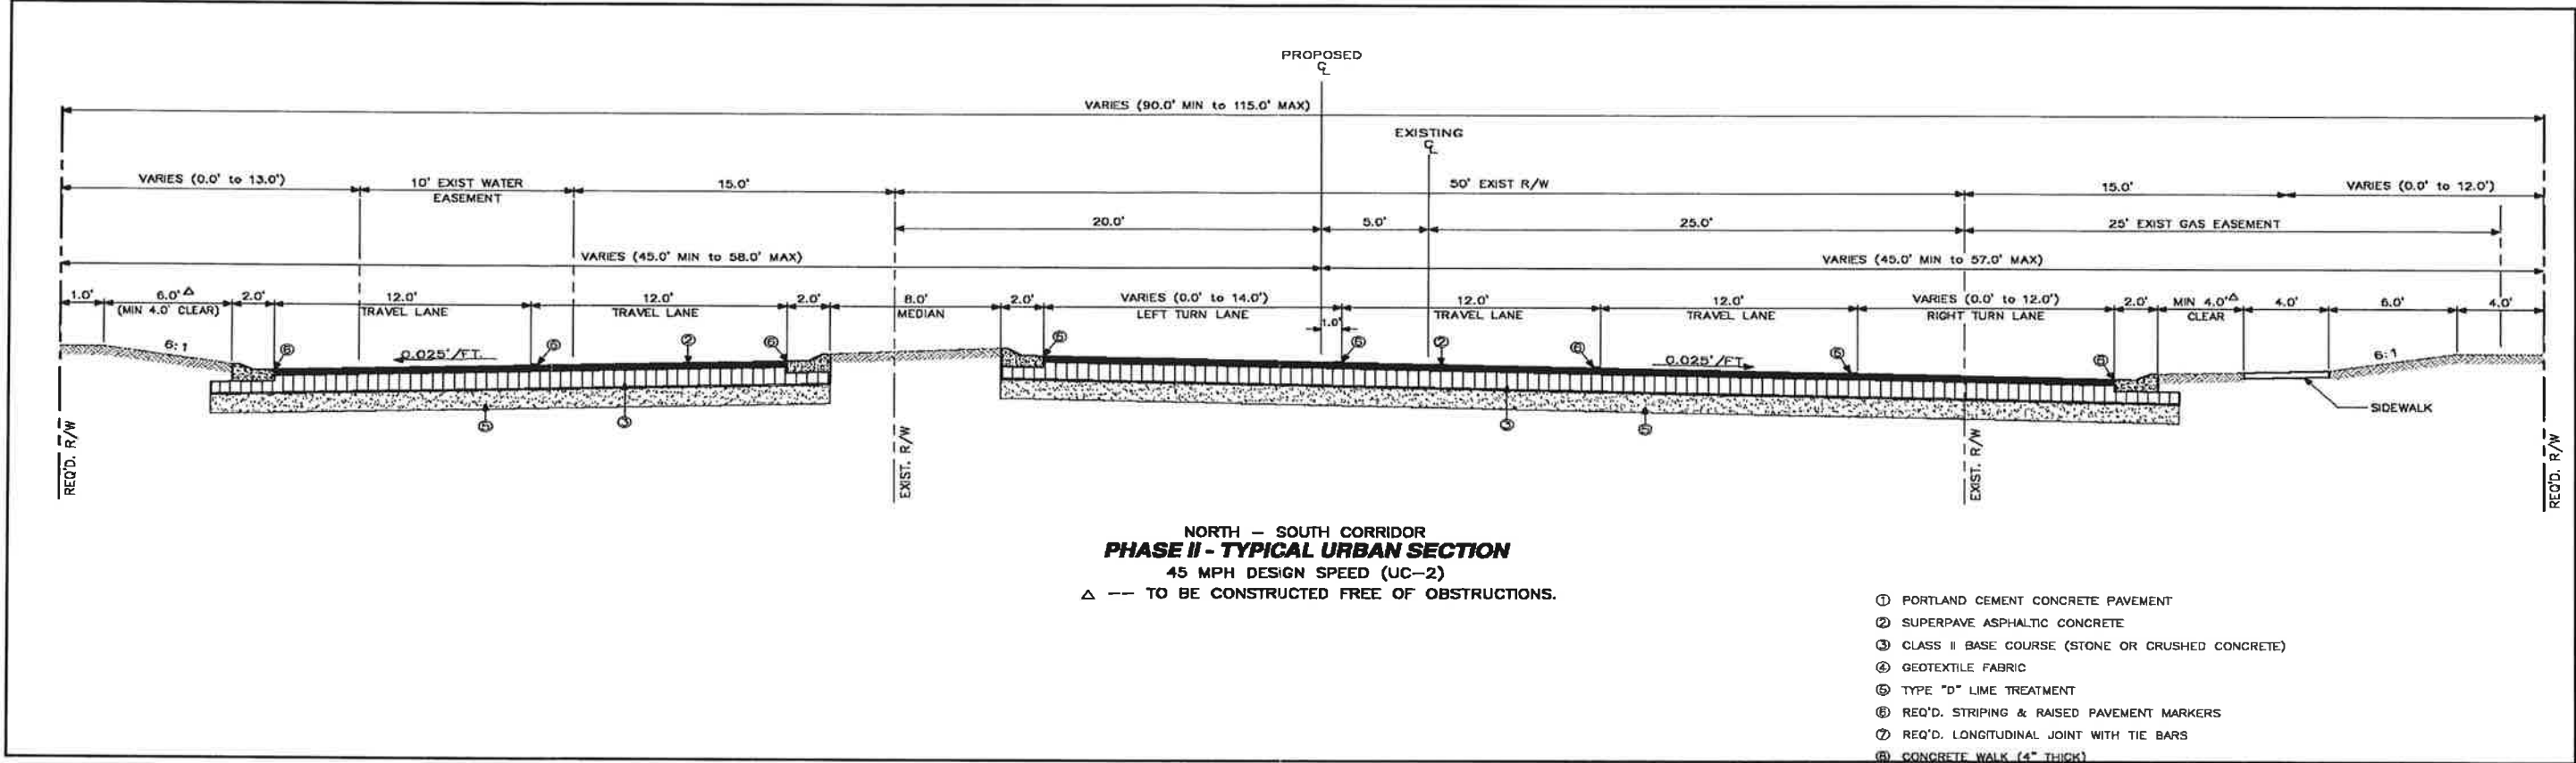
Typical Urban Roadway Section, Full Build Out
